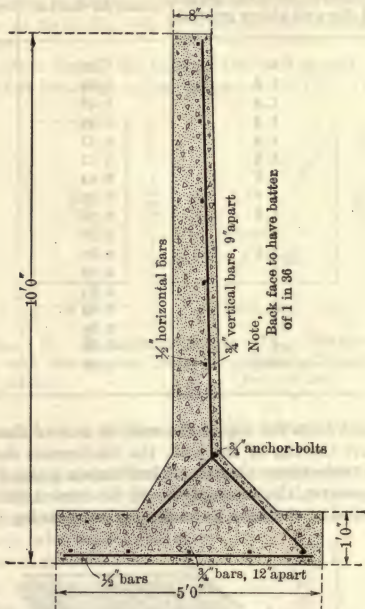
Reinforced-concrete Retaining-wall, 10 ft High
